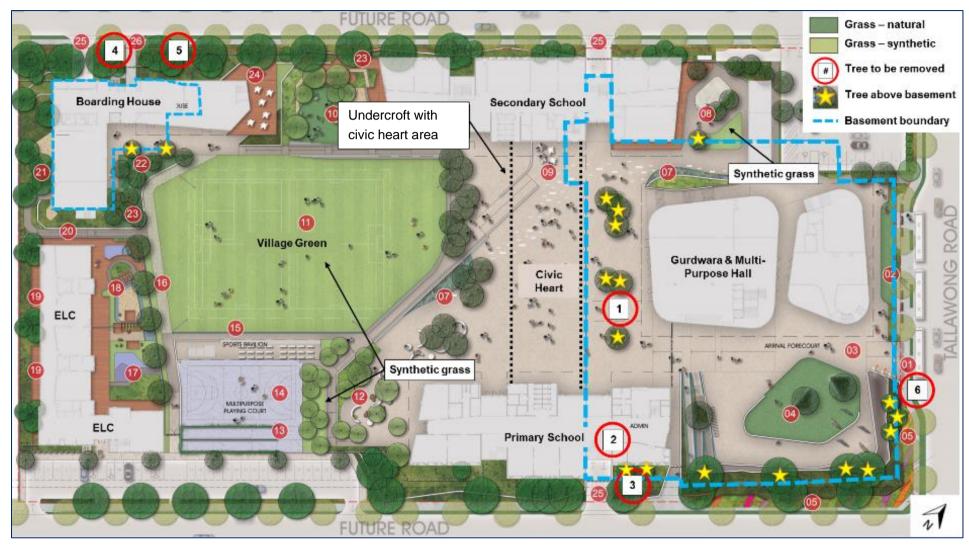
| Proposed landscaping and tree removal plan, including location of basements and tree plantings above basements (Source: Applicant's RtS 2020)
